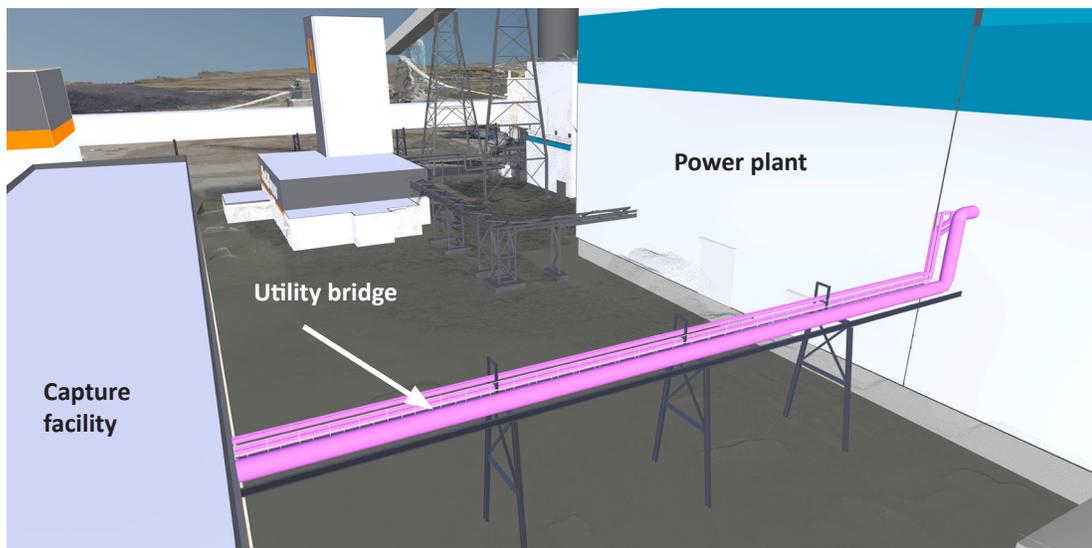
Proposed design and location of the pipe and utility bridge (highlighted in pink)
